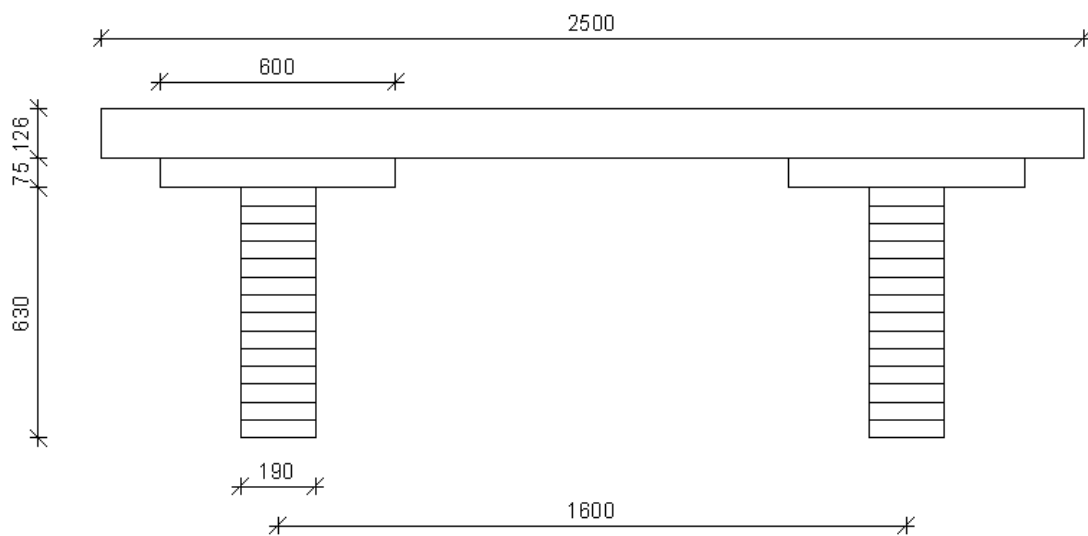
Cross section of the bridge without handrails and waterproof coverings
